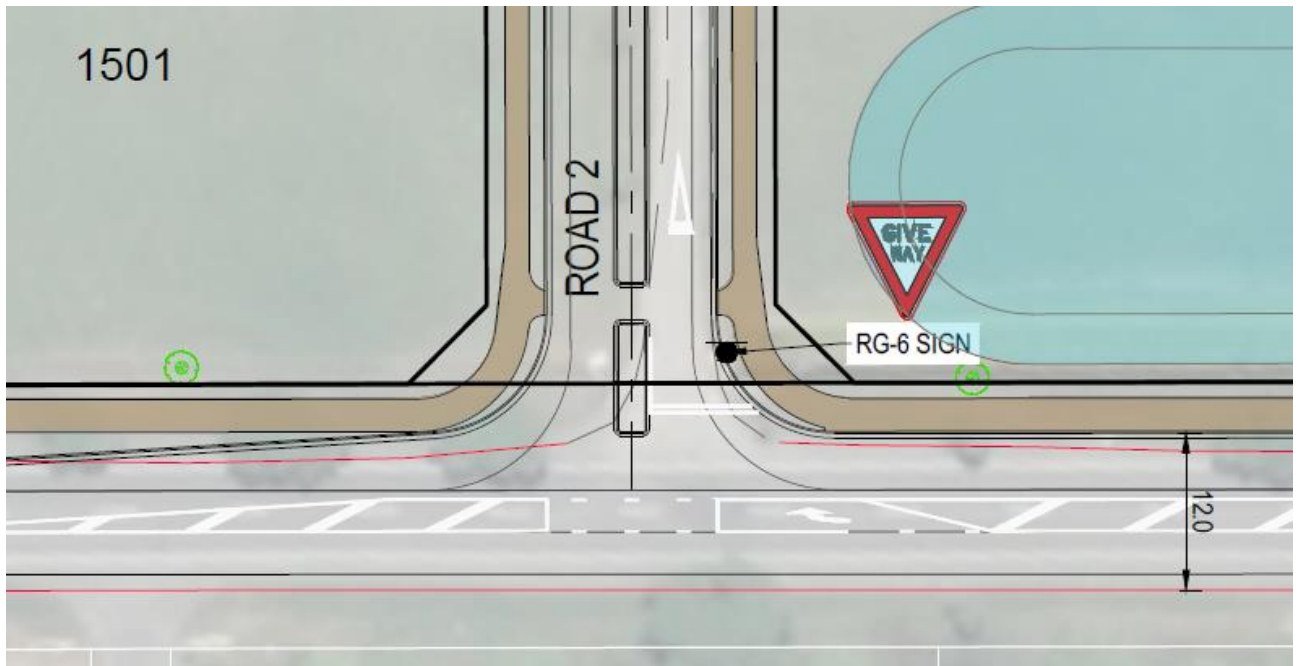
Proposed Intersection Layout of Road 2 / Kippenberger Avenue
